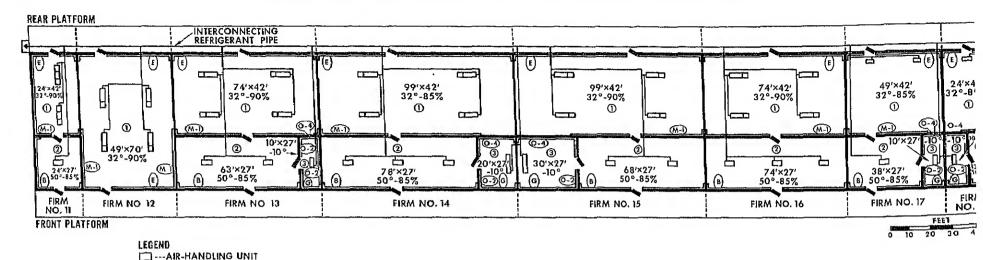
Situation II, Building No. 2 (meat and meat products), floor plan and air-handling equipment layout.
